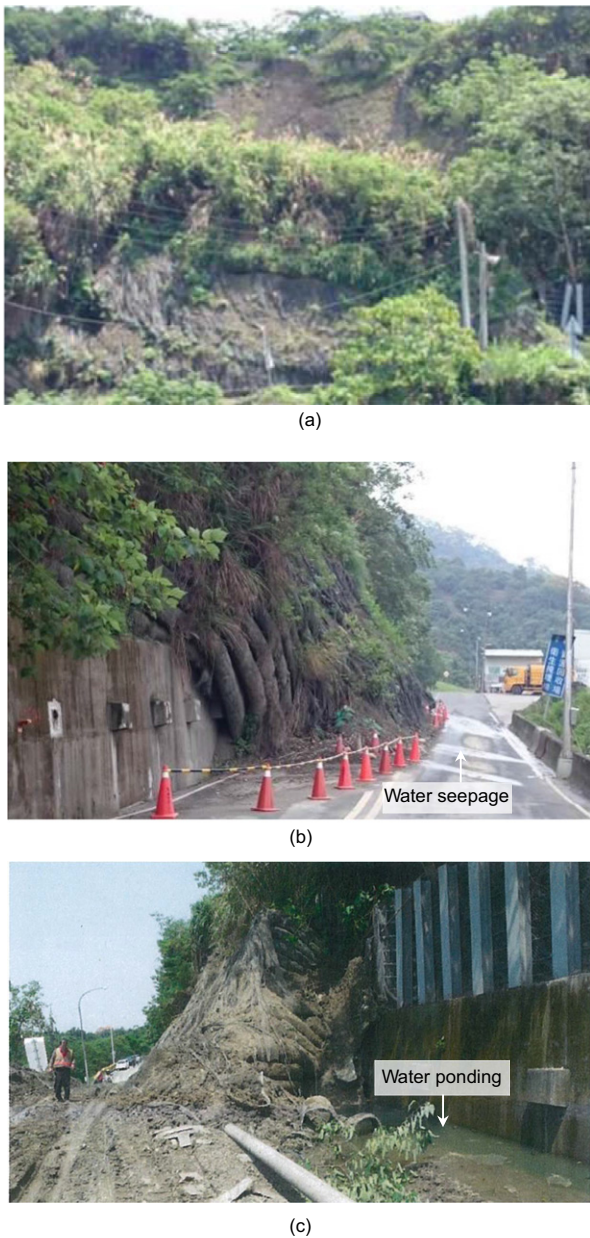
Slope failure: (a) Overview; (b) slope toe with water seeping out from backfill; (c) another view at the slope toe with water ponding (images provided by Taiwan Professional Geotechnical Engineers Association)
